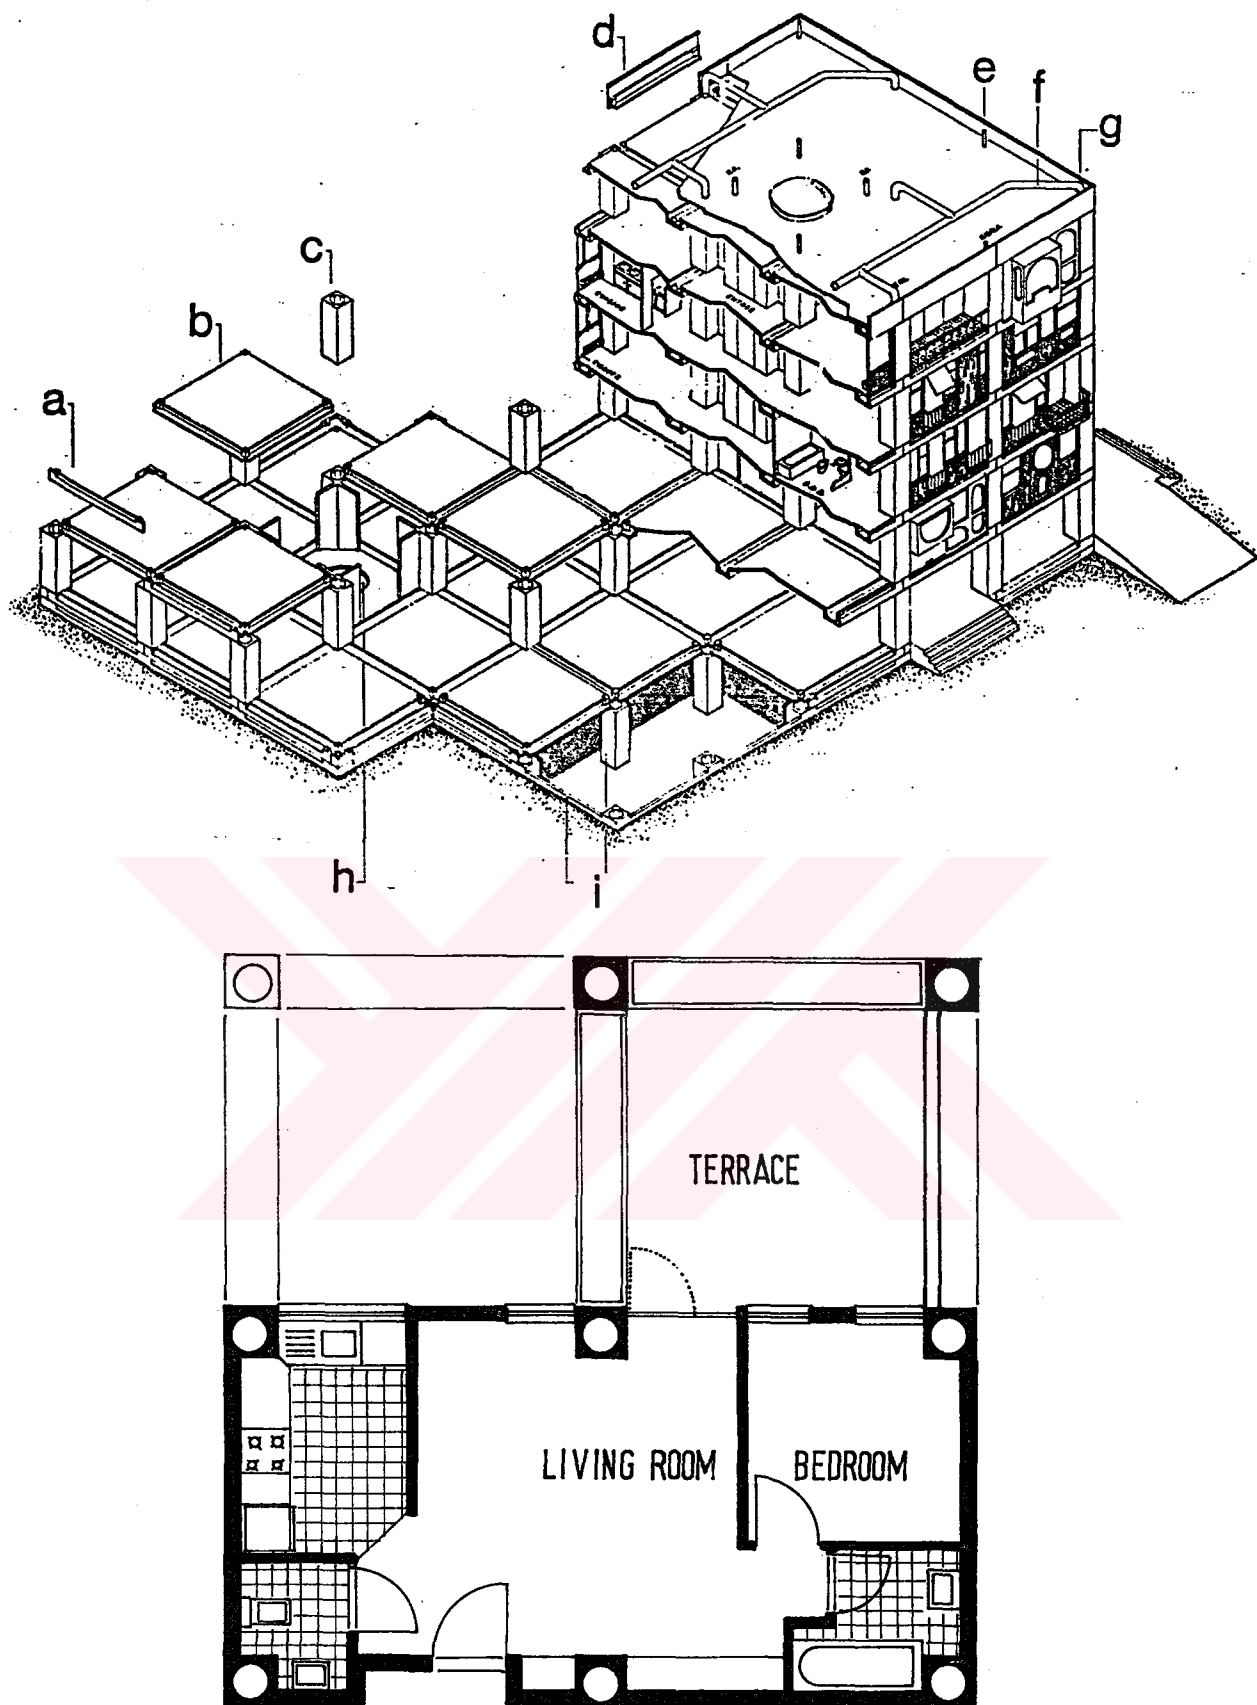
Plan and Axonometric Drawing of Small Size Dwellings in Les Marelles, France (Source; The Scope of Social Architecture, 1984).
